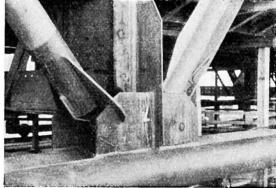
Lower chord junction showing a single tube diagonal, joined to a double tube chord by a notched transversal plate welded to the gusset plates again by fillet weld.
